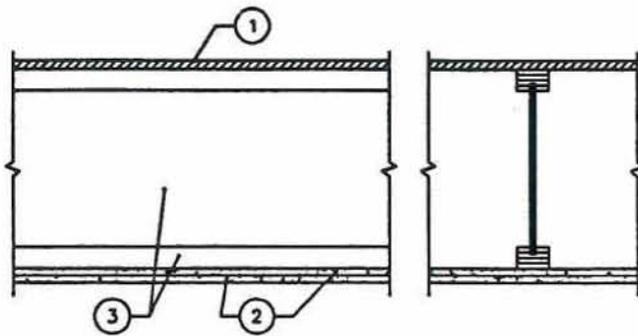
OPEN WEB TRUSS DETAILS—(Continued)
